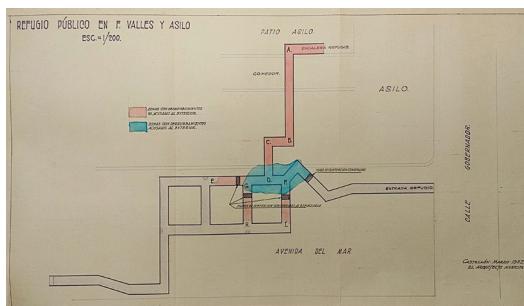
F. Valles-Asilo Shelter. Floor plan, AHMC (Note 1) 1952, Municipal architect,
